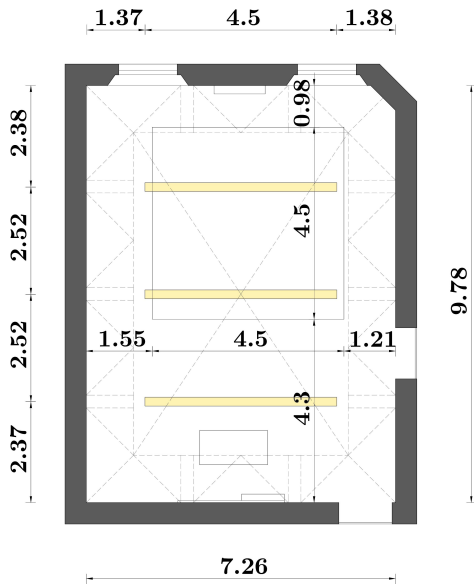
Case A plan; height of the luminaires at 3.80 m.
